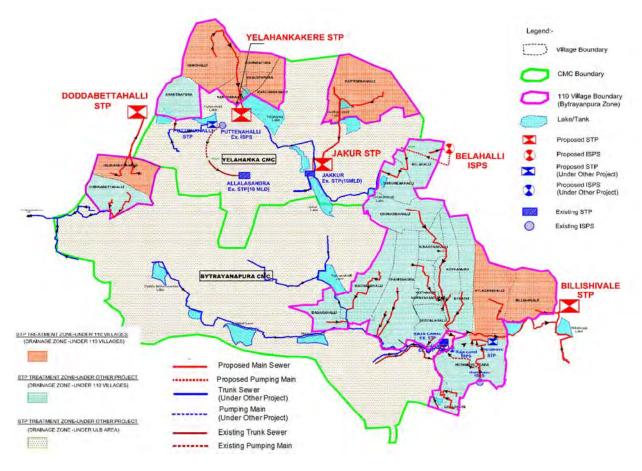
Layout Plan of Main Sewer Lines for All Zones
